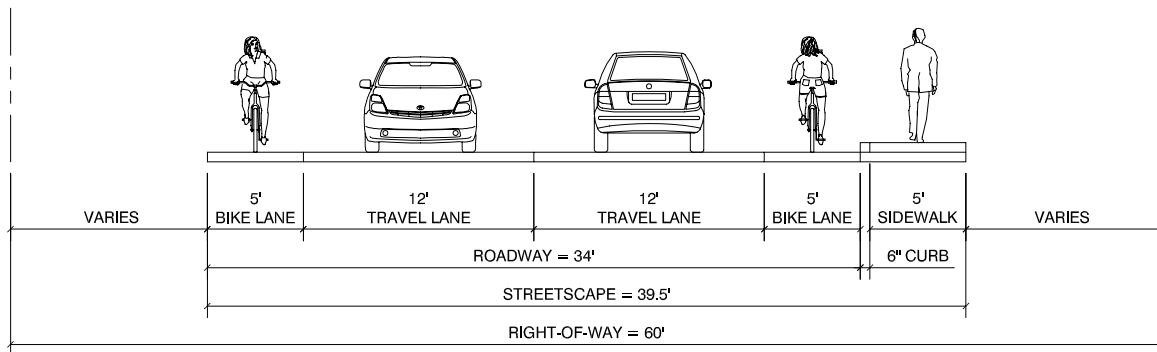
and 8-8 illustrate more generalized cross-sections for remaining collector facilities within the City to provide both flexibility and guidance when improving or constructing collector facilities. These collector cross-sections provide the City the ability to provide exclusive or shared bike lanes and/or on-street parking, as needed on a particular collector segment.
